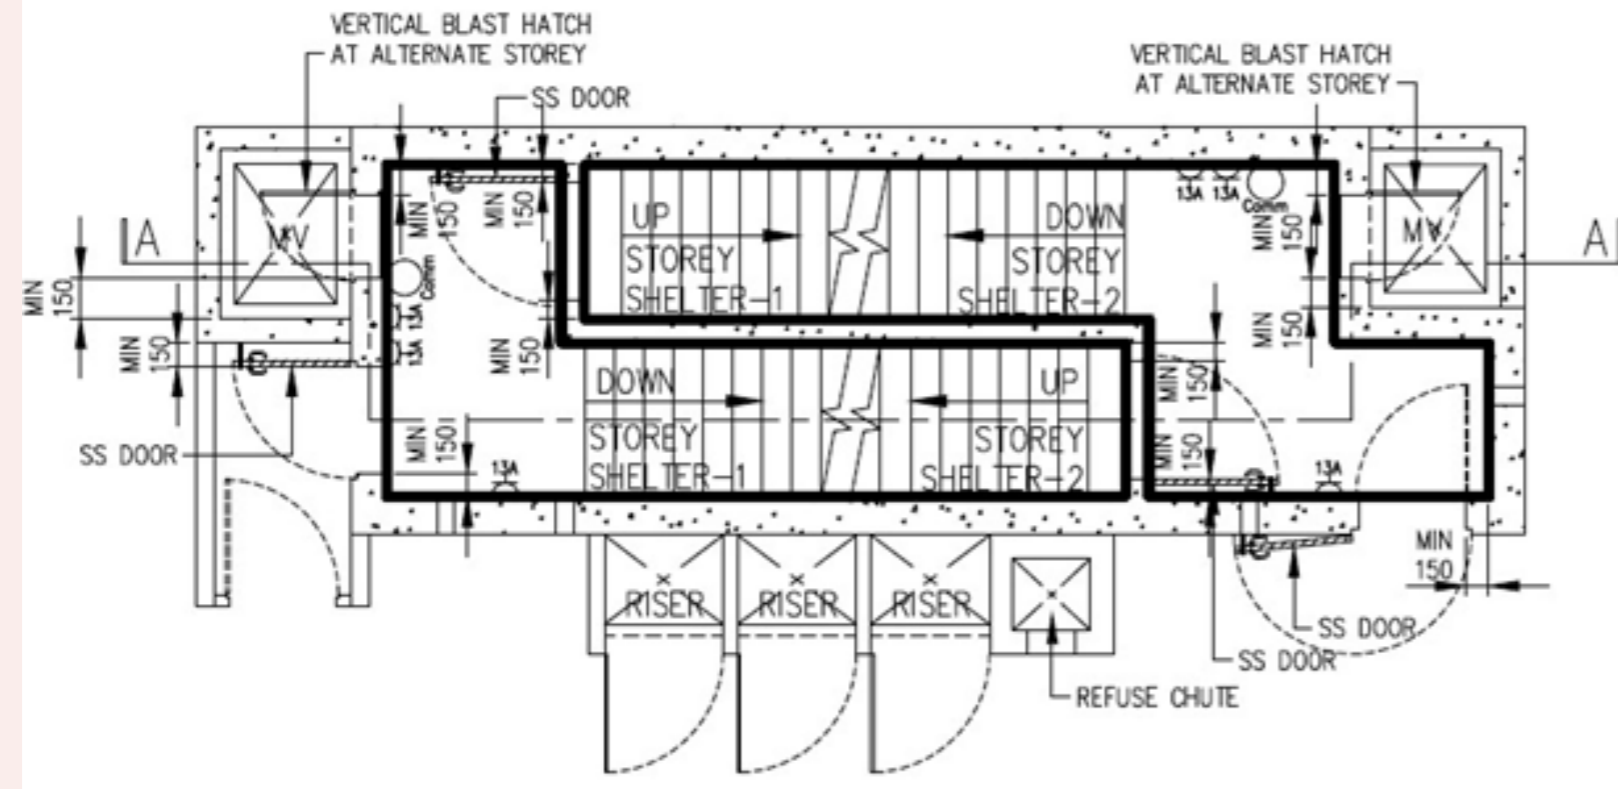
(j): SCISSOR S/C SS COMPARTMENT PLAN
